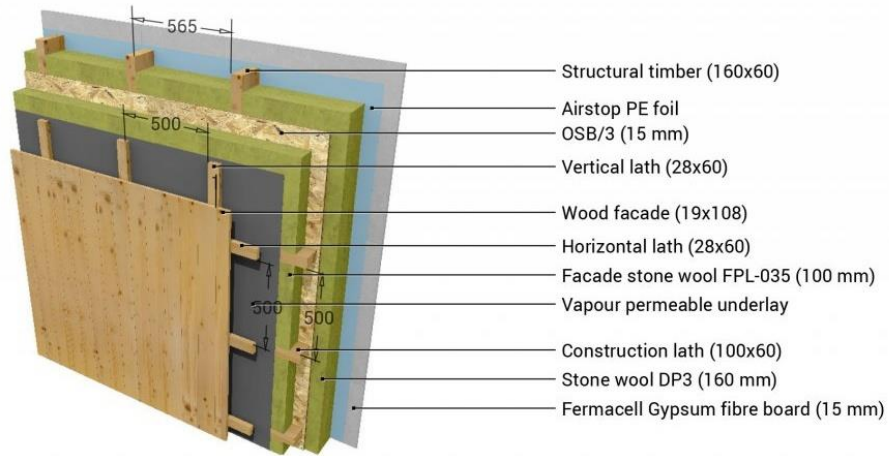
Steco centar external wall detail second example (thermal and heat protection values and moisture proofing are as same as the wall in Figure 45)
